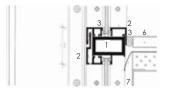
[above] Crown Zellerbach Corporation Headquarters: vertical section through the curtain wall at floor level
